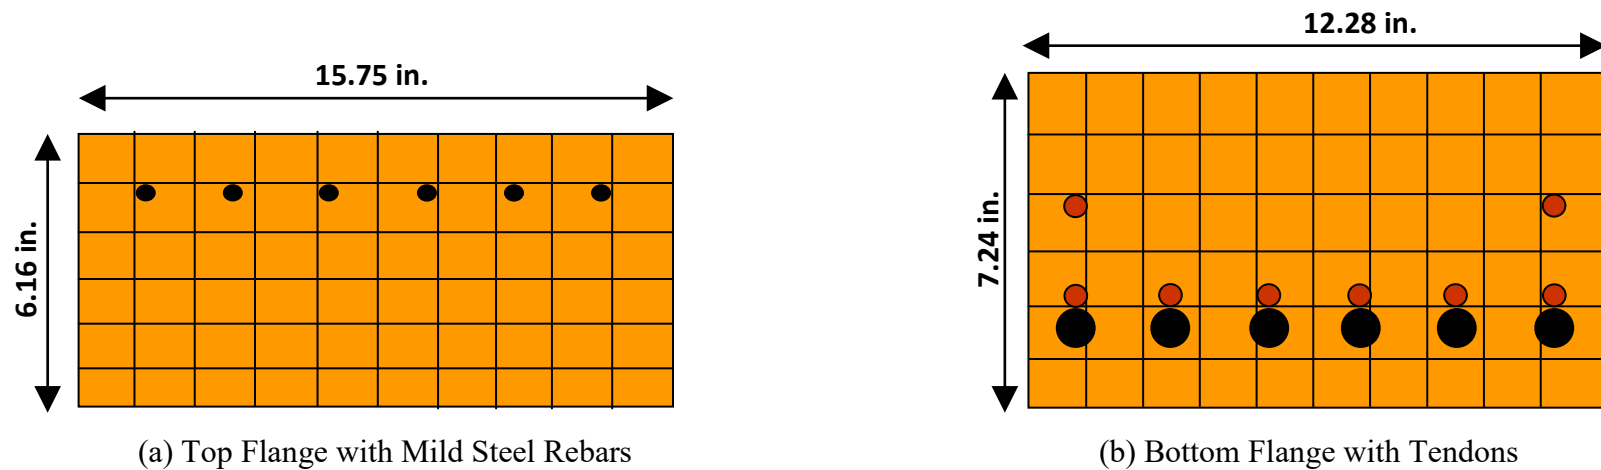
Section Discretization of Nonlinear Beam-Column Elements for Girder Specimens C2 and C4
